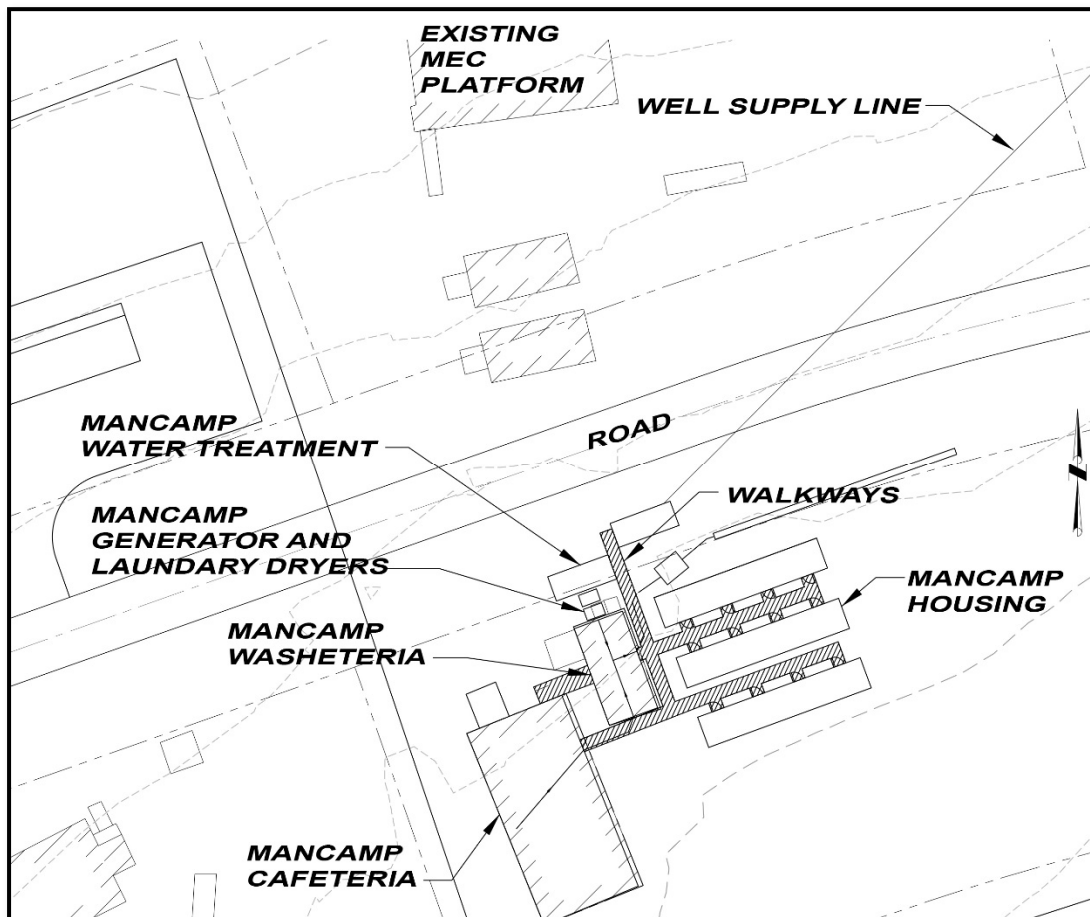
Goldstream Engineering Construction Camp Layout Plan
